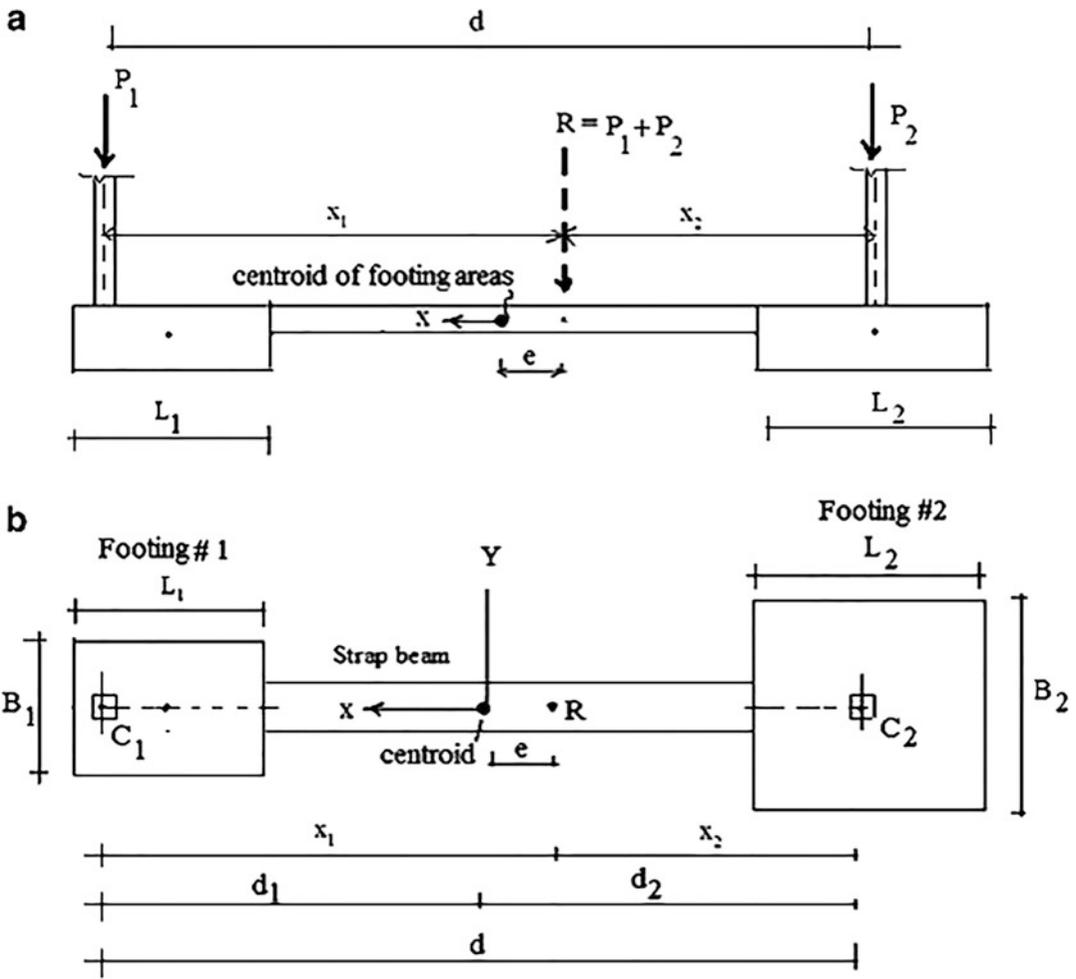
Notation and pressure distribution for strap footing. (a) Elevation. (b) Plan
